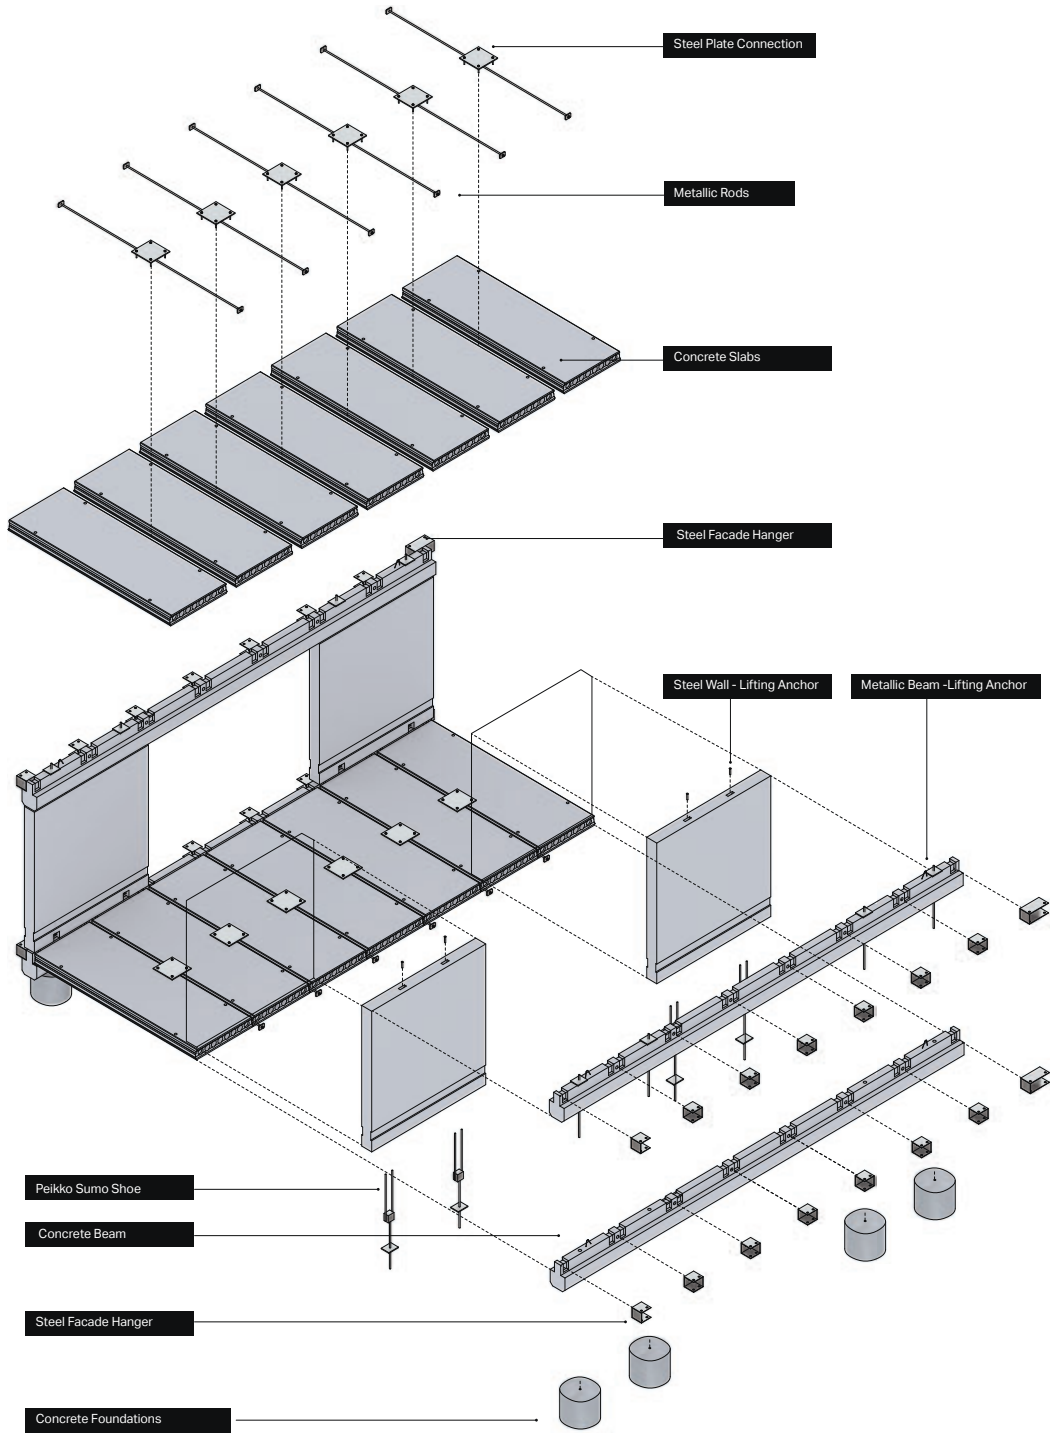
Exploded view of a concrete structure designed for disassembly and reuse.
